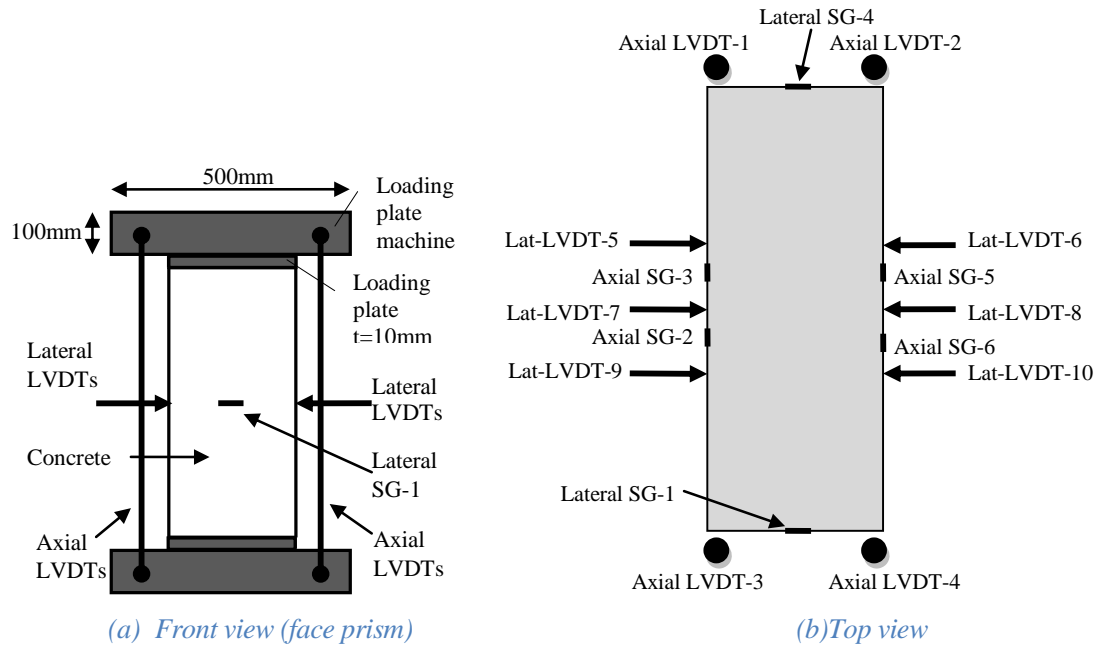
Layout of the transducers and strain gauges of concrete prism.
